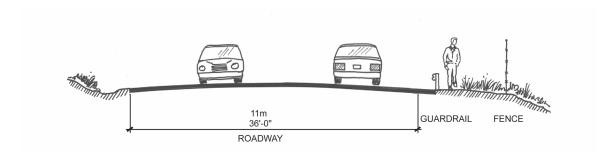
Existing Conditions at Lincoln Boulevard at Crissy Field Avenue
